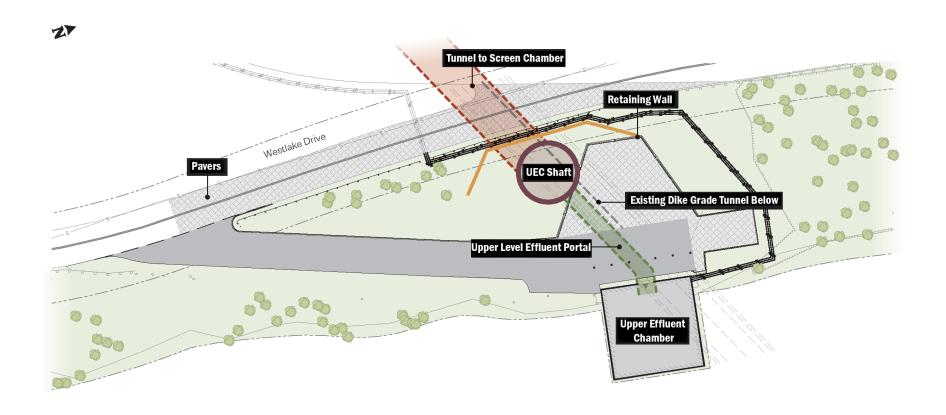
Upper Effluent Chamber – Site Plan
